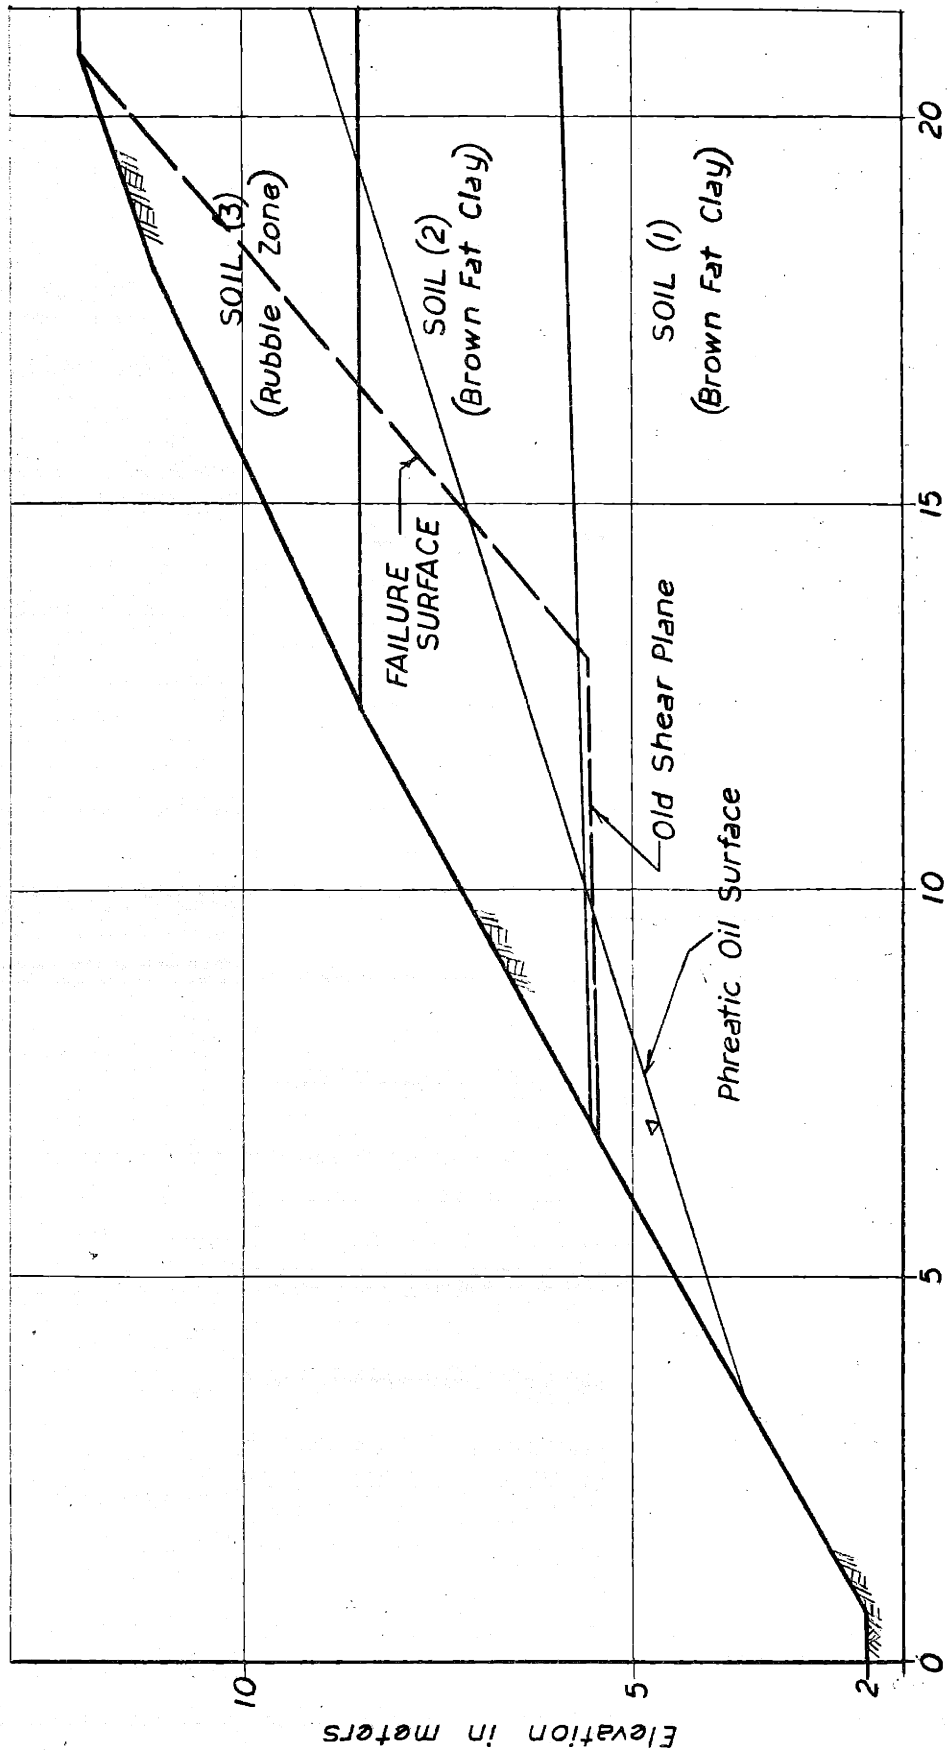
CROSS-SECTION OF FORS-2 NORTH WALL AT ϕ OF 1965 SLIDE ZONE
